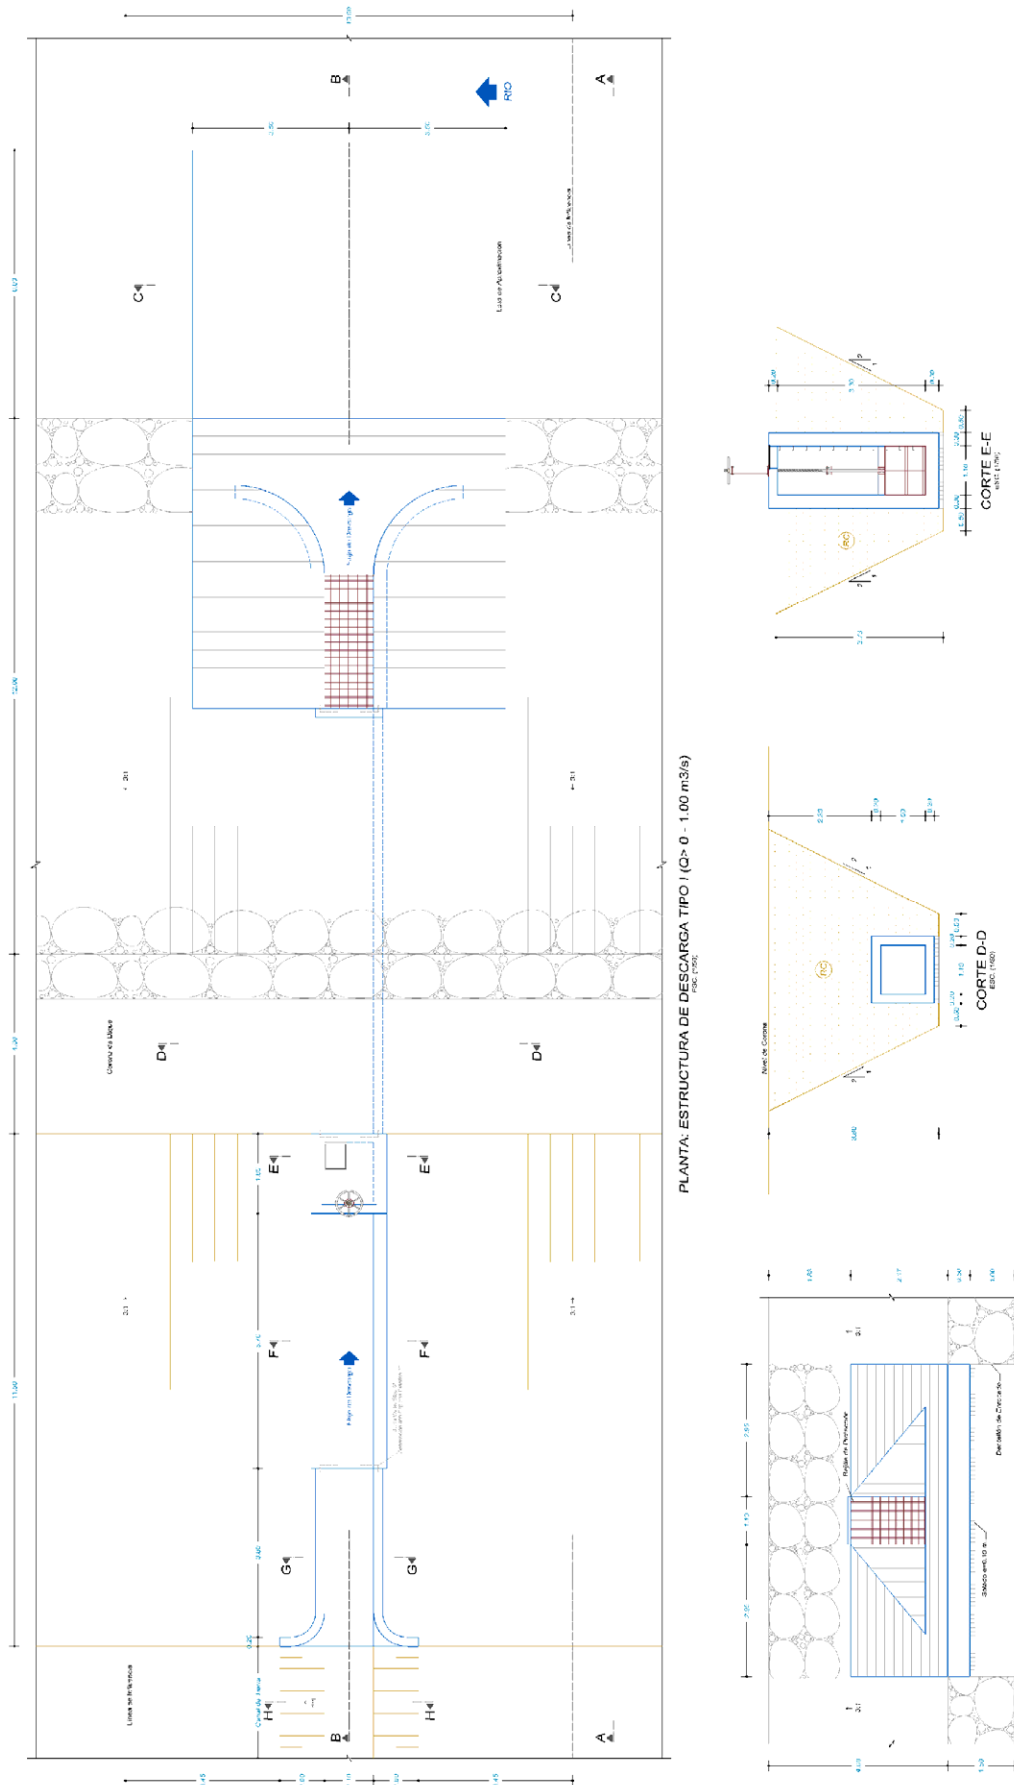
Structure Drawing of Drainage Facility Type I (1/2)
